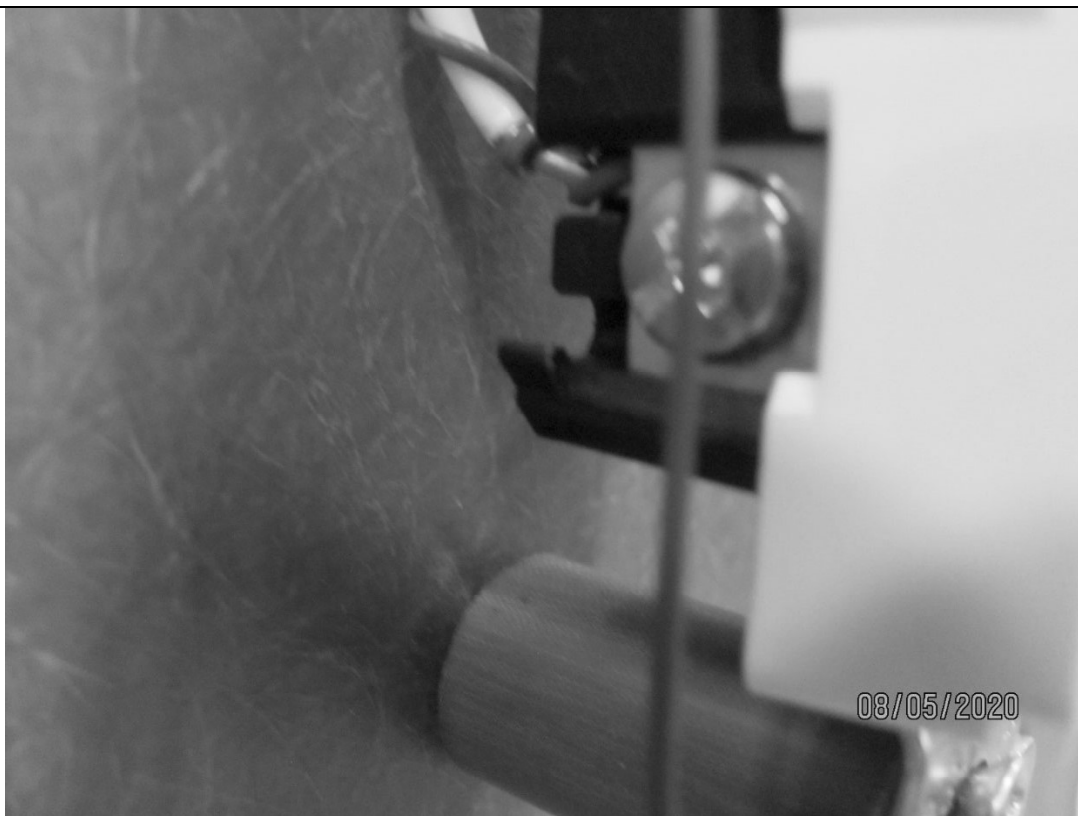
Typical Installation of Receptacle Since Conductor Back Wired
